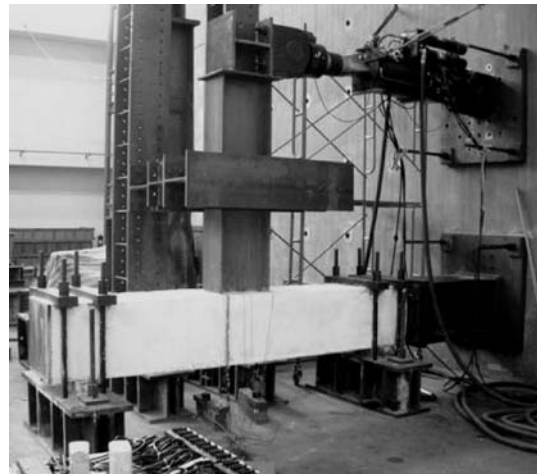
A steel beam-to-SRC column joint specimen ready for cyclic loading test
